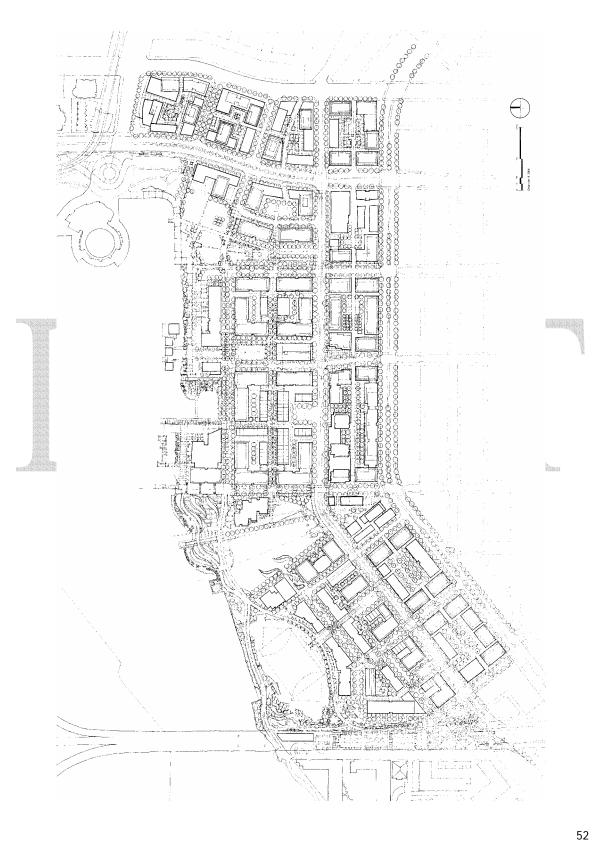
Illustrative Plan (Alternative Entrance to Manitoba Street)
